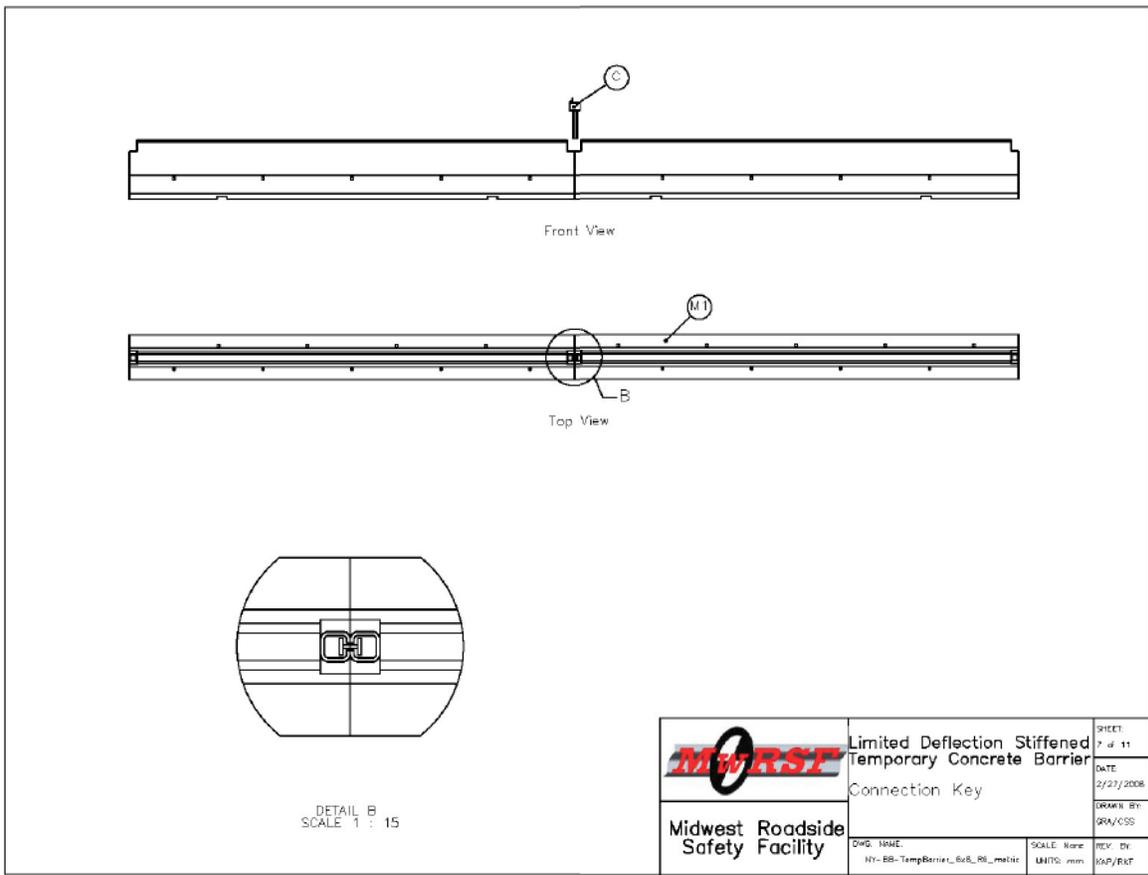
Temporary Concrete Barrier Connection Details, Test NYTCB-3
